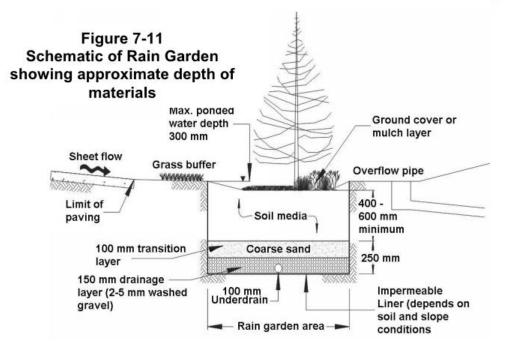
Proposed Rain Garden Cross Section (Source: HBWG Stormwater Management)
